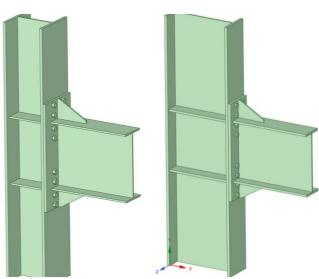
(a) American section 8-Bolt Extended Stiffened End Plate Connection (b) Indian section 8-Bolt Extended Stiffened End Plate Connection
